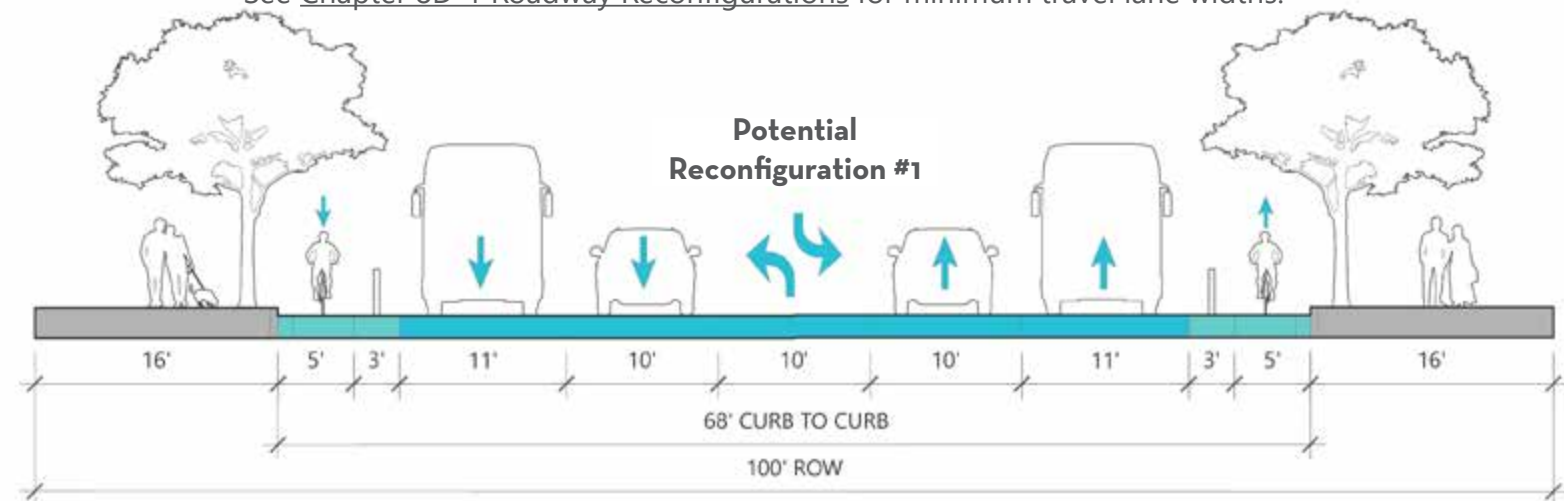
Potential Reconfiguration #1: One-Way, In-Street, Class IV Bikeway on an Arterial Street.
